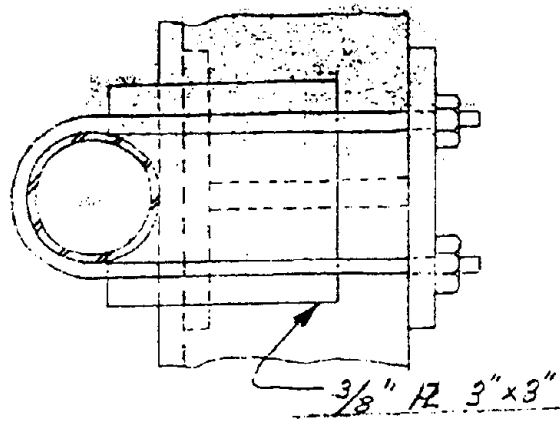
Detail of Upper Horizontal Bar of Sign Bridge
